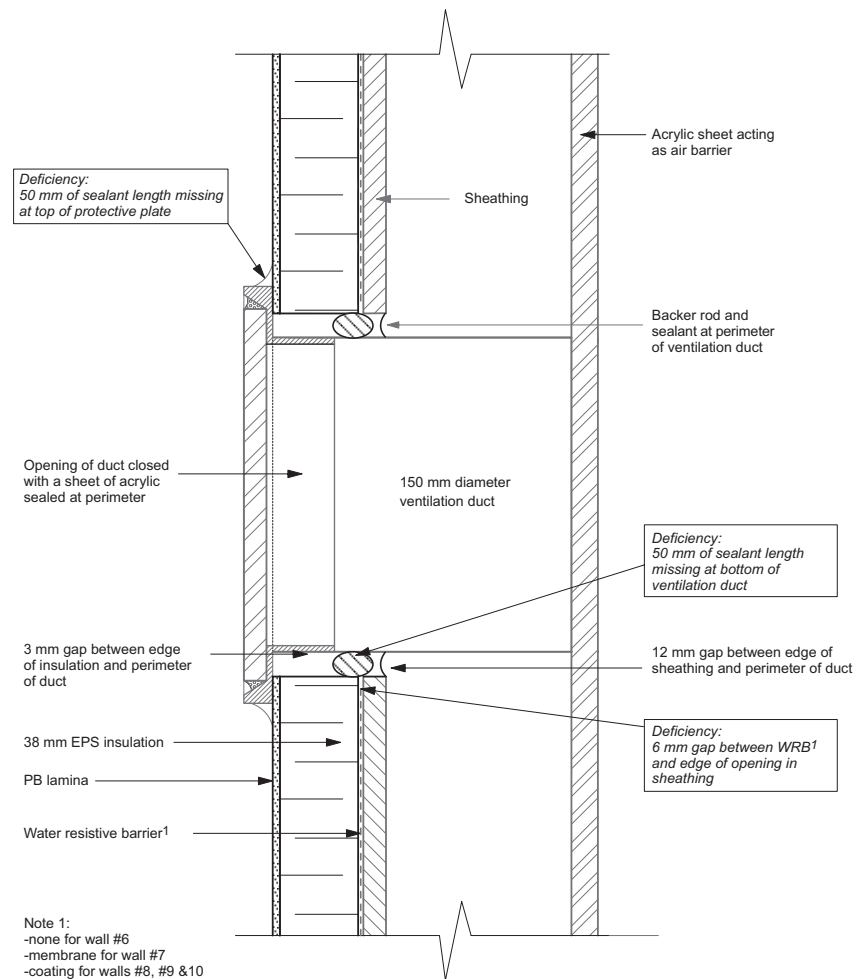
Example of the detailing at the duct/wall interface for an EIFS-clad specimen – Vertical section
